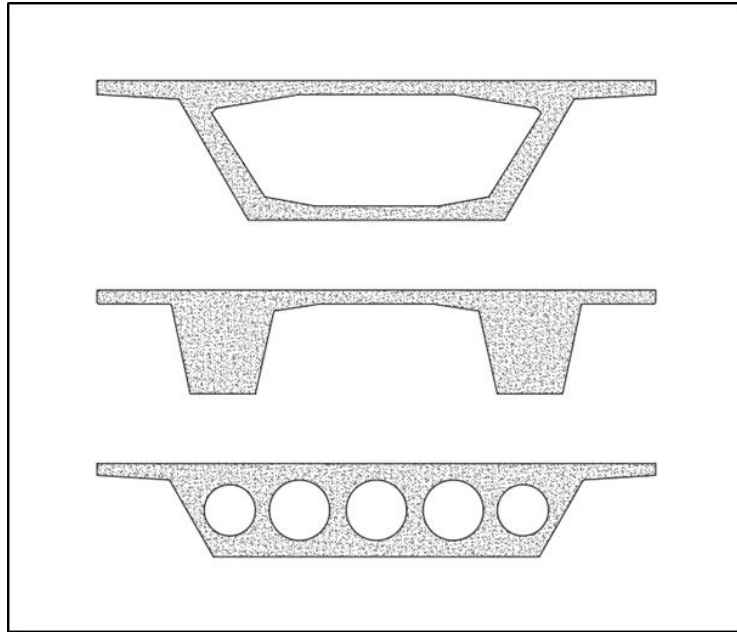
Ordinary High-speed Railway Deck, Cast in Place Sections
